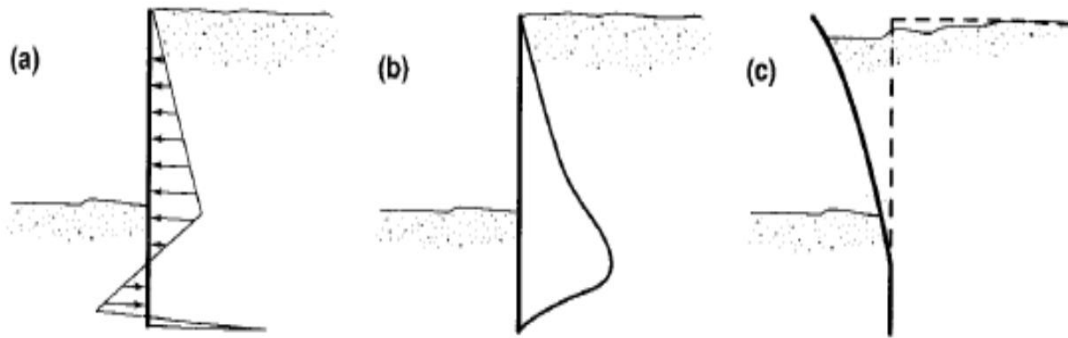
(a) Soil pressures: (b) bending moments, and (c) flexural failure mechanism for cantilever retaining wall.
